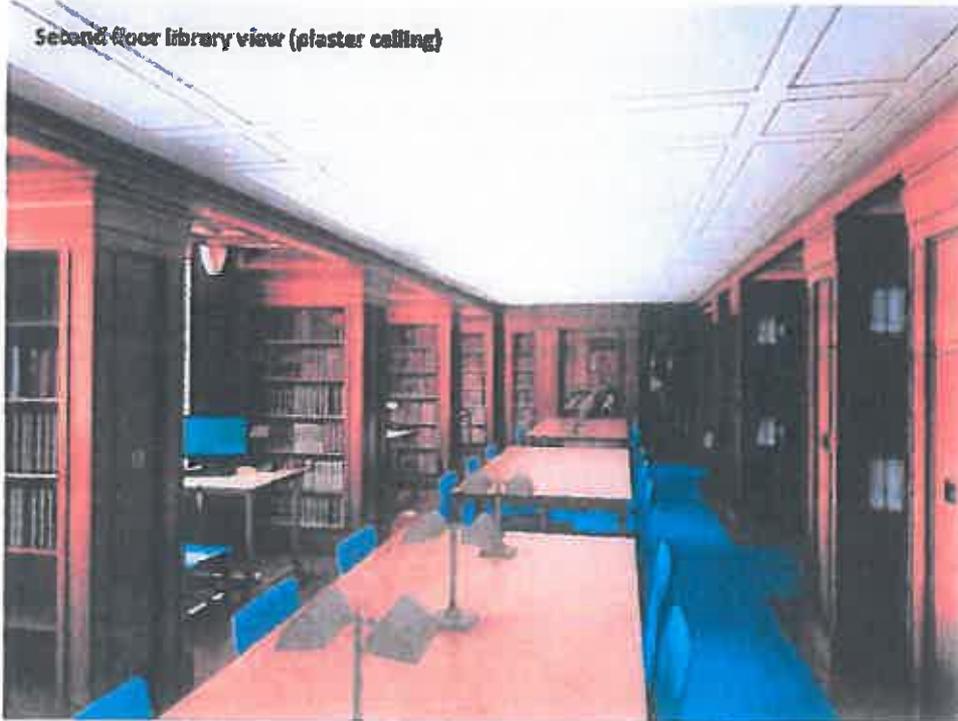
, 12, 13, & 14 – Annotated photos – Showing impact of proposed sever through Galley with new flat ceilings generally throughout Library and additional down-stands under proposed auditorium
